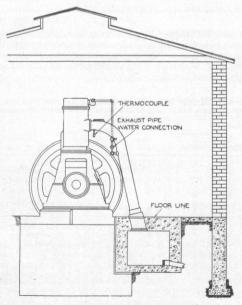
Individual Exhaust Pipe and Underground Conduit Arrangement (99YKA62)
